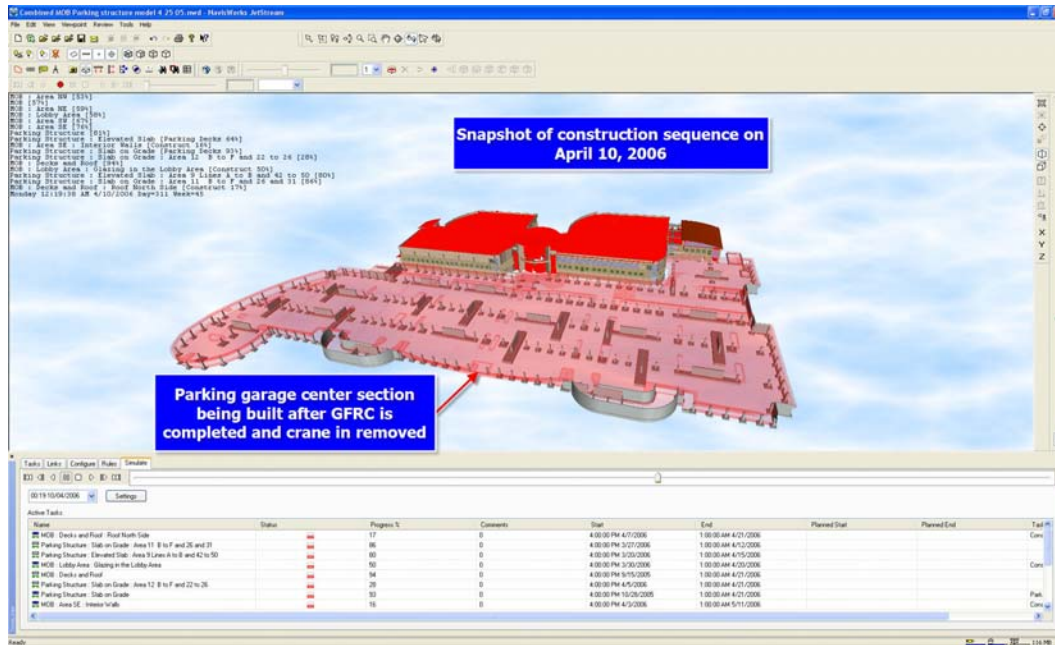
b: Snapshot of the 4D model of the construction of the Camino Medical Group Project in Mountain View, California showing column and shear wall construction on April 10, 2006. The center section of the garage foundations and slab on grade is constructed after the steel erection is complete, the GFRC panels for the MOB have been installed and the crane has backed out. Image courtesy DPR Construction, Inc., CA, USA.
